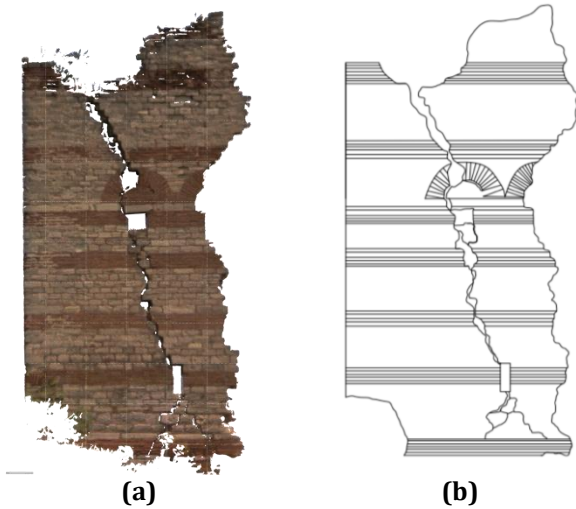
The deliverables of the TLS surveying: (a) an orthophoto of Land Walls' Tower; (b) an architectural drawing of Land Walls' Tower drawn over the orthophoto
